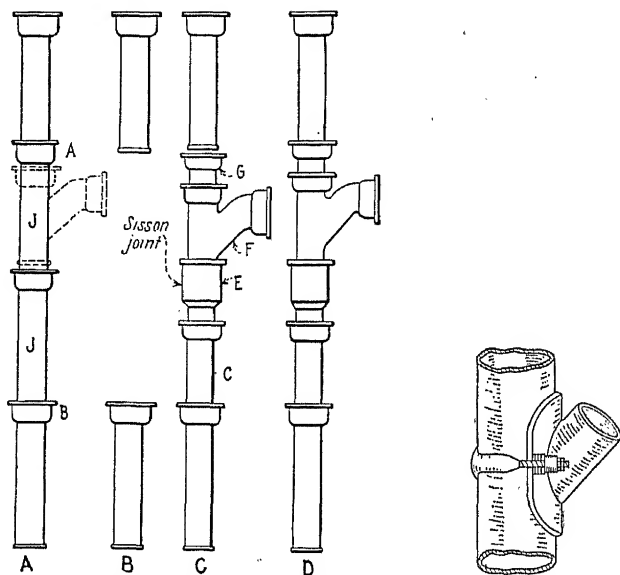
Method of inserting a Sisson joint. FIG. 40.—Saddle fitting.
